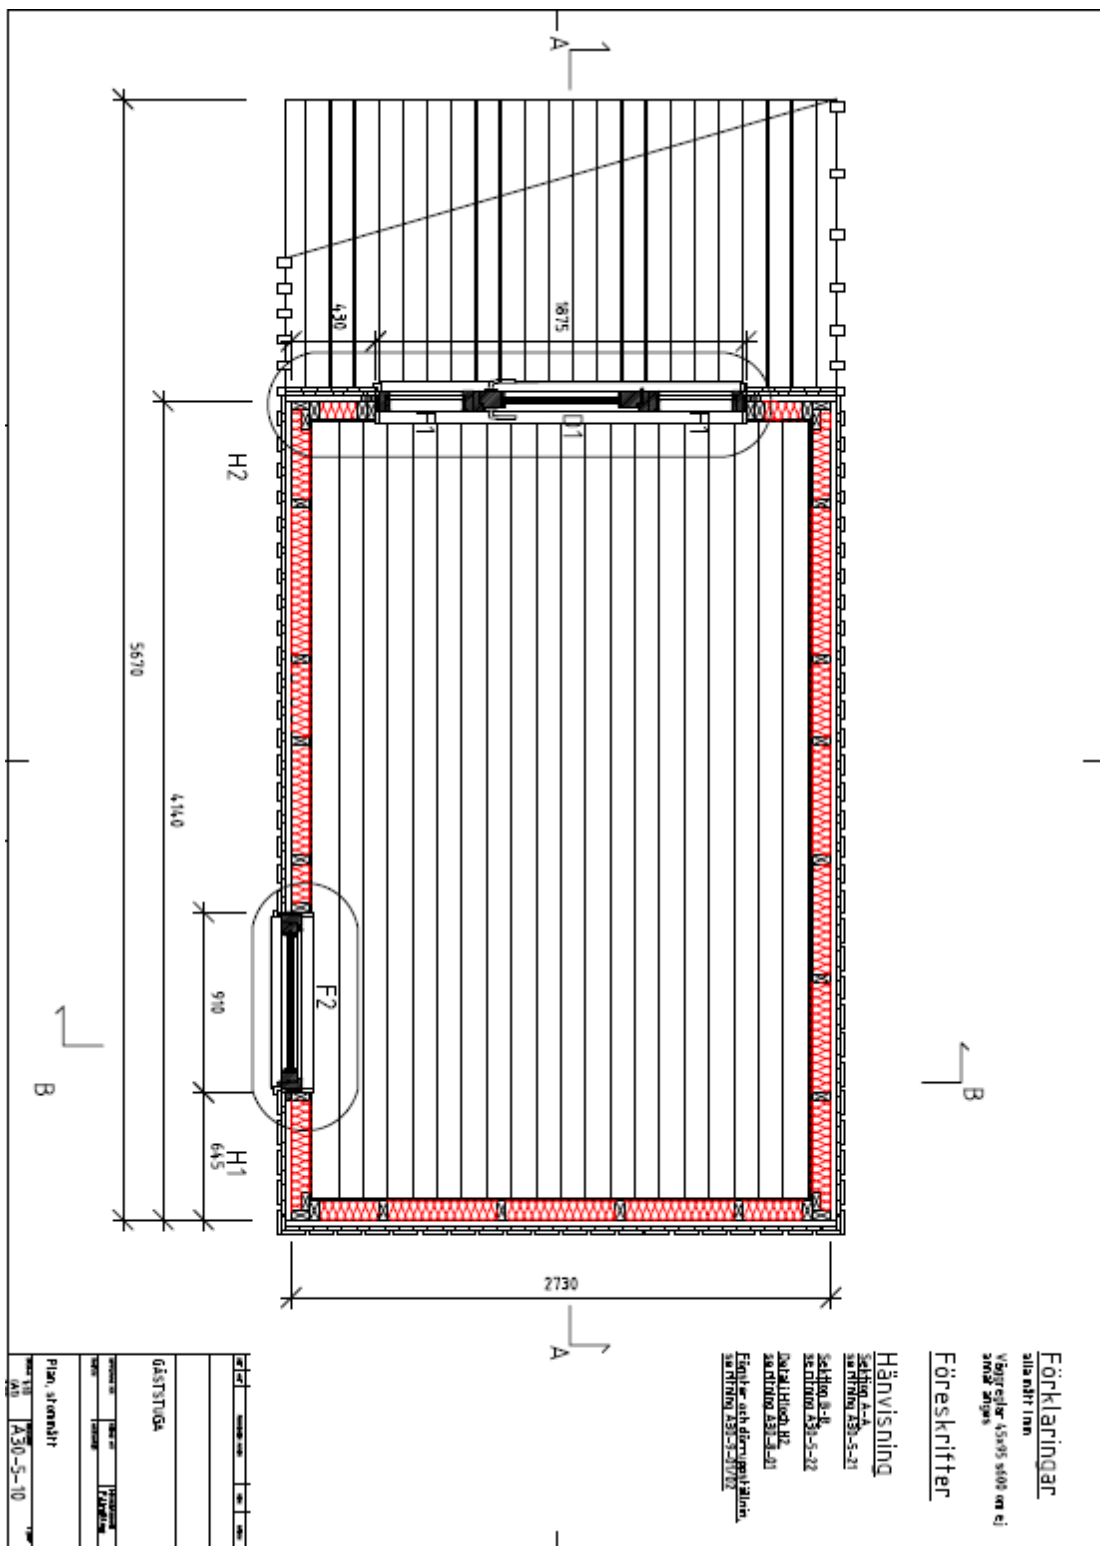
Plan drawing, Friggebod (Architect: Andrea Brandén)
